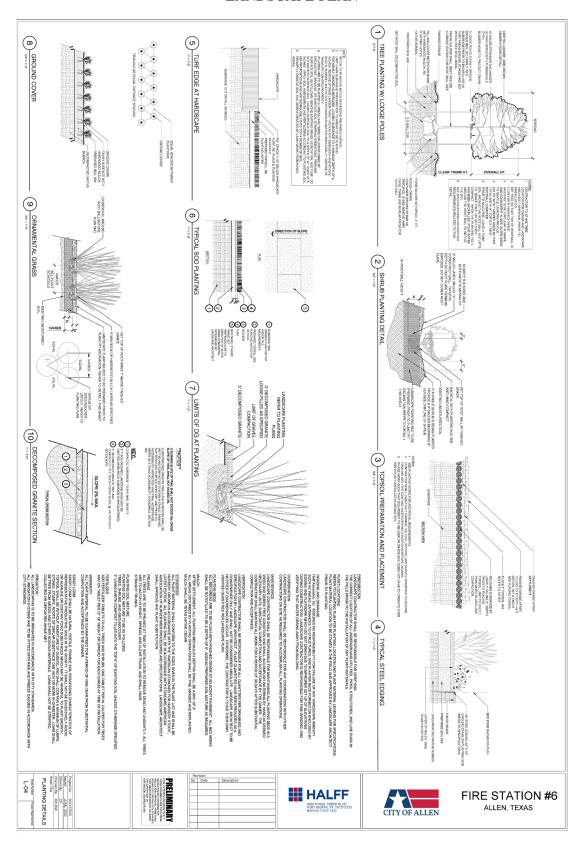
EXHIBIT "D" LANDSCAPE PLAN (cont.)
